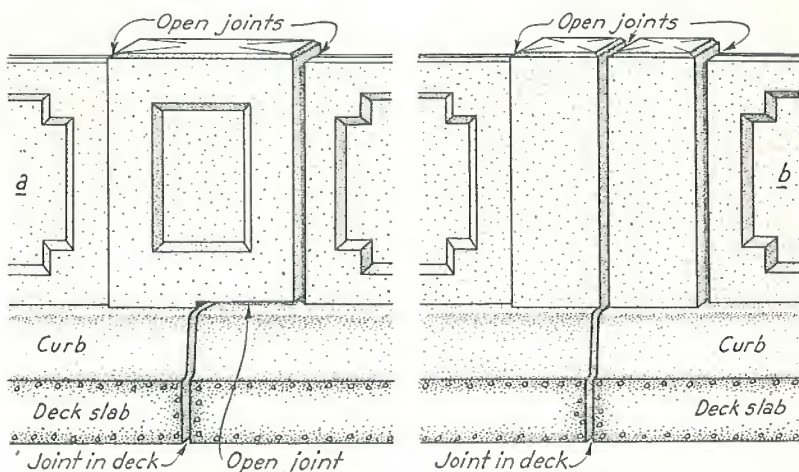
Post details suitable for use at deck joints over piers and abutments. Type *a* has one undivided post attached to one side of the joint, while type *b* has two posts separated by an open joint.
